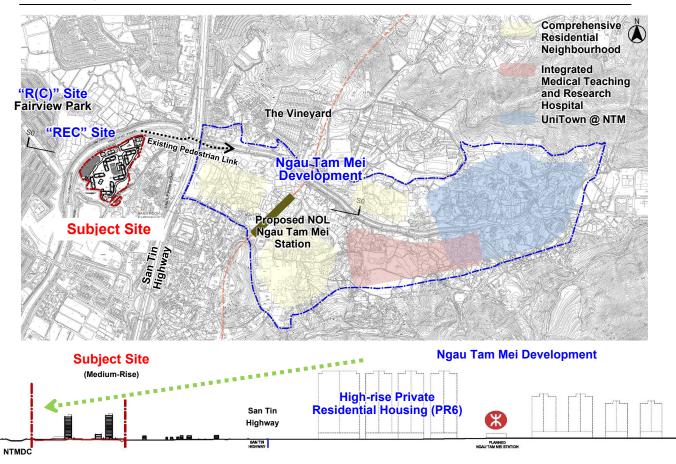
Stepped Building Height Concept adopted for the Proposed Development
